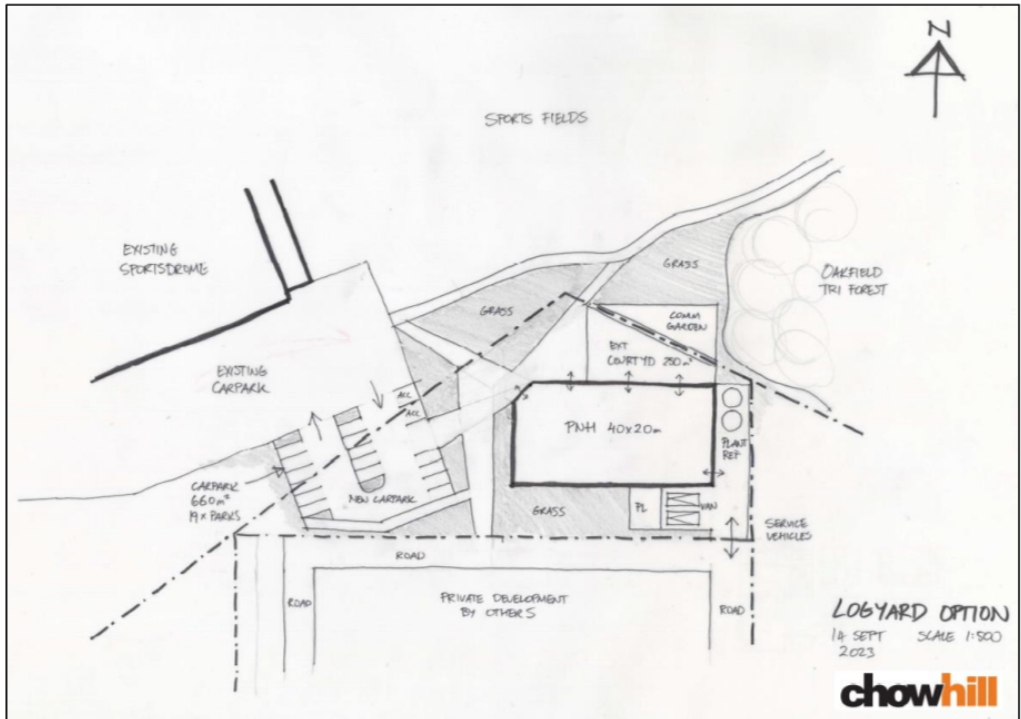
Option 4- Proposed PNH Building layout on Karewa Place Site
